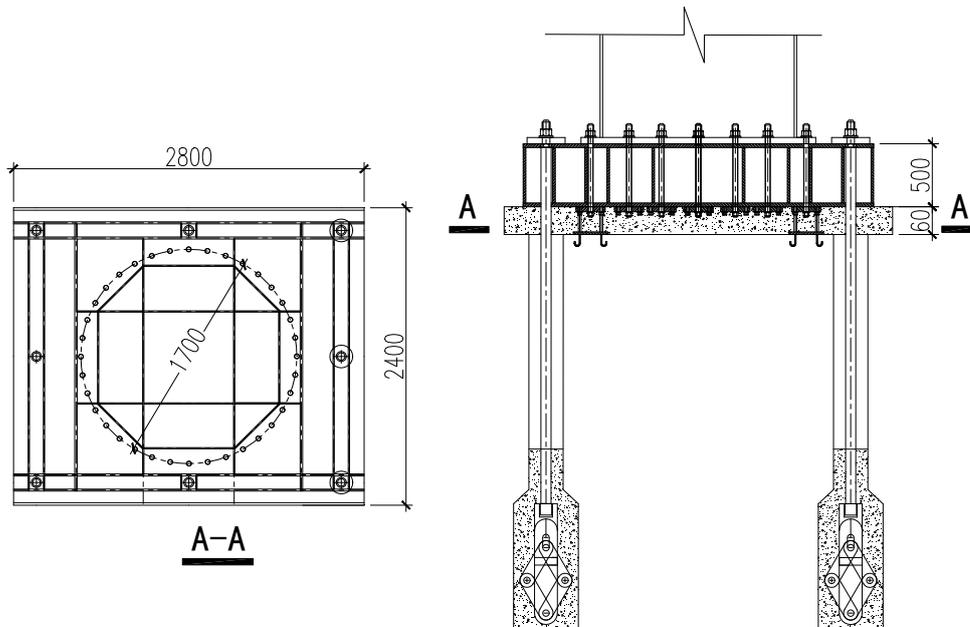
Rock anchor bolt foundation sketch (Unit: mm)
